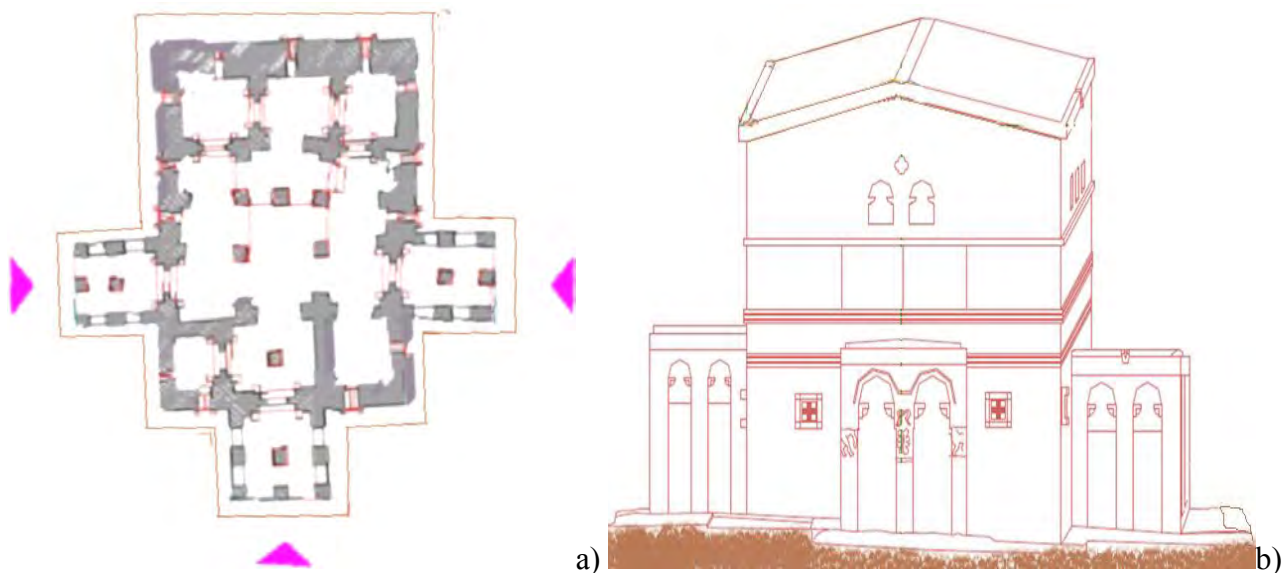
a) The Floor Plan of *Bete Mariam* b) The Front (East-West) Elevation Plan of *Bete Mariam
